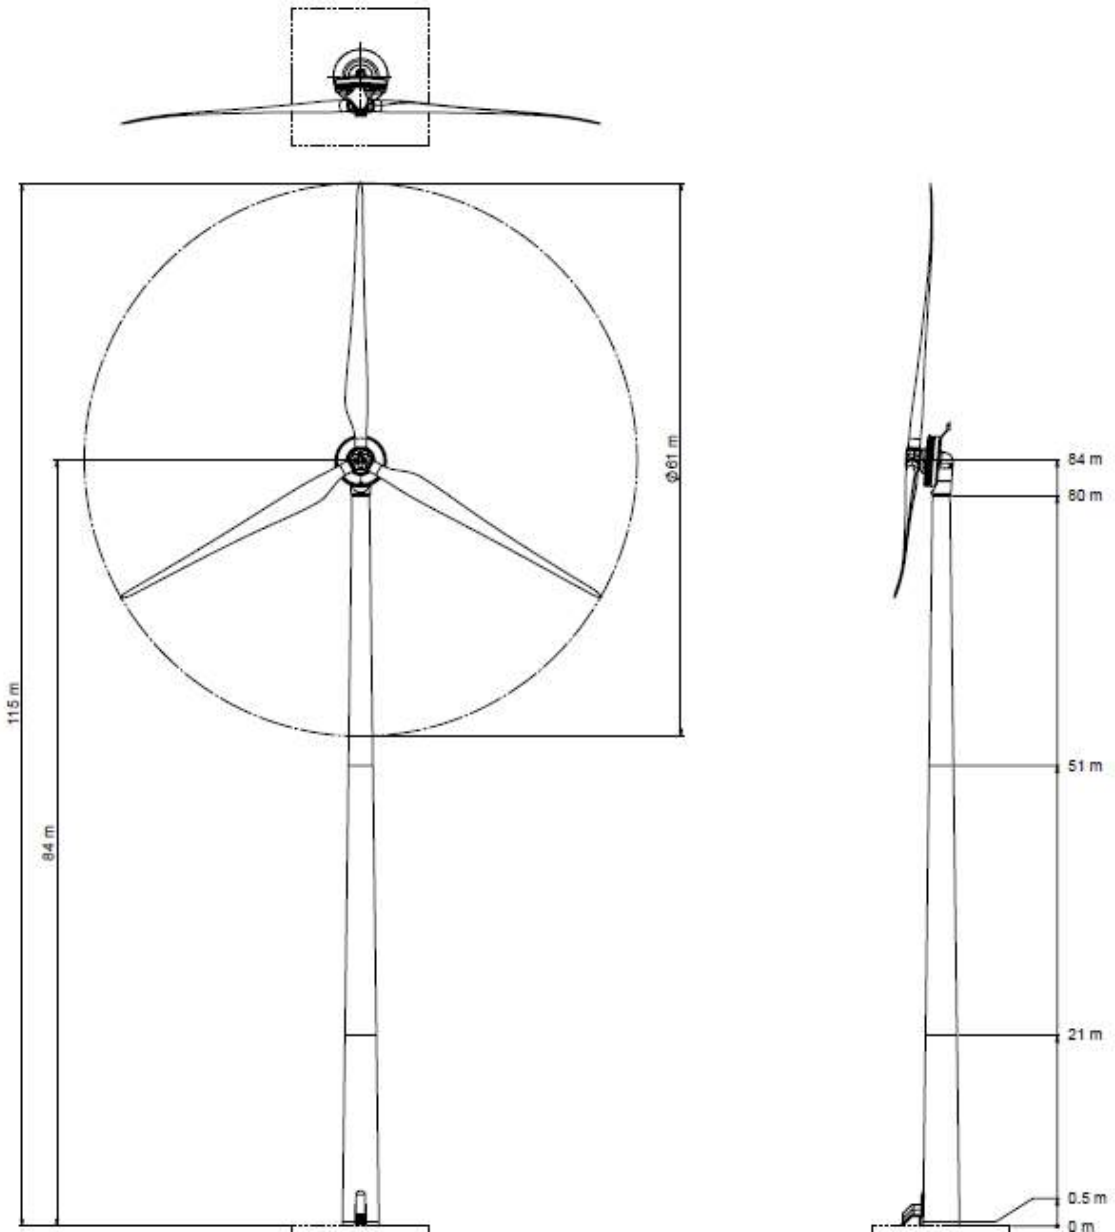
Plan of the Candidate EWT DIRECTWIND 61 – HH84
